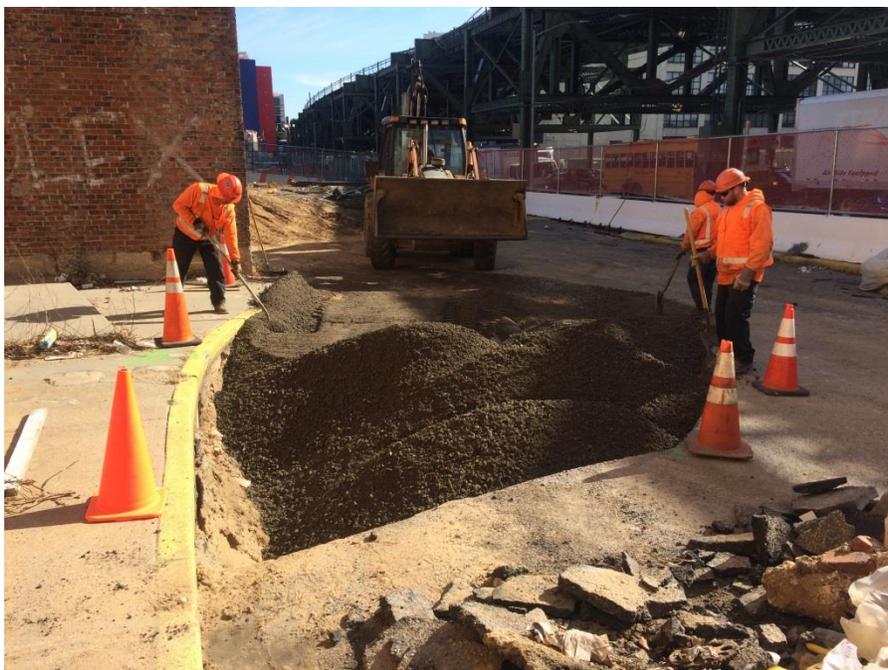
AARCO using RCA to backfill the excavation to grade. (3/30/2017)
